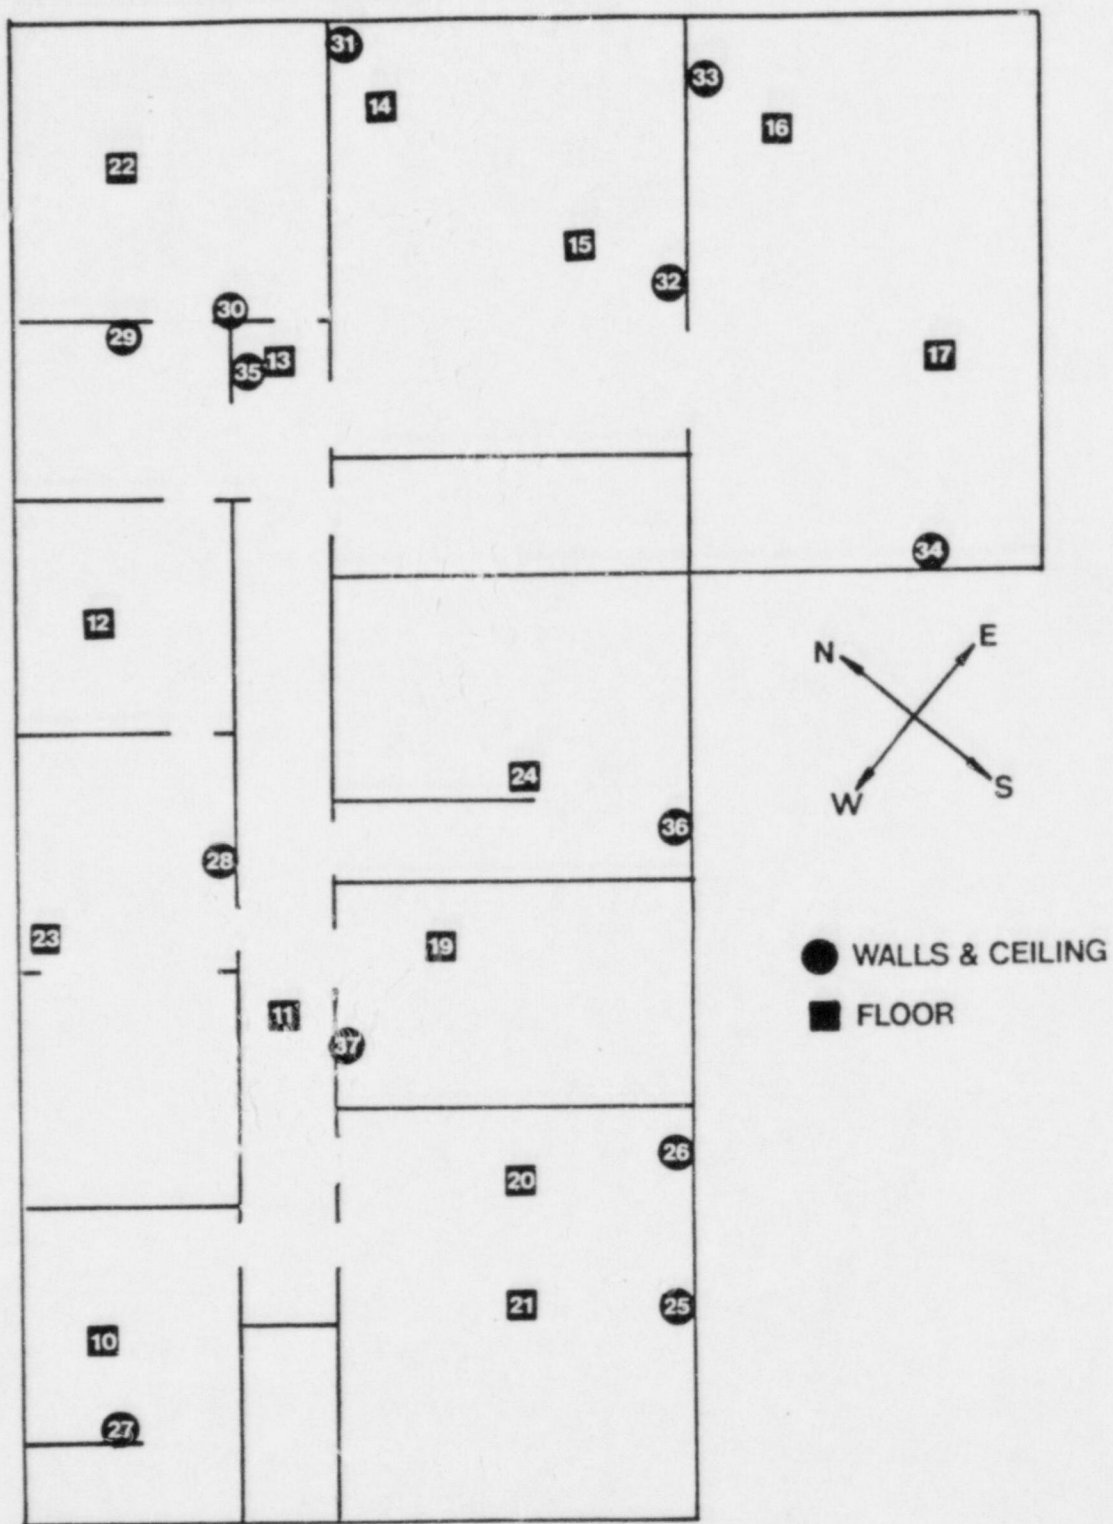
Floor Plan of the Lab Building Indicating Locations of Measurements and Smears
